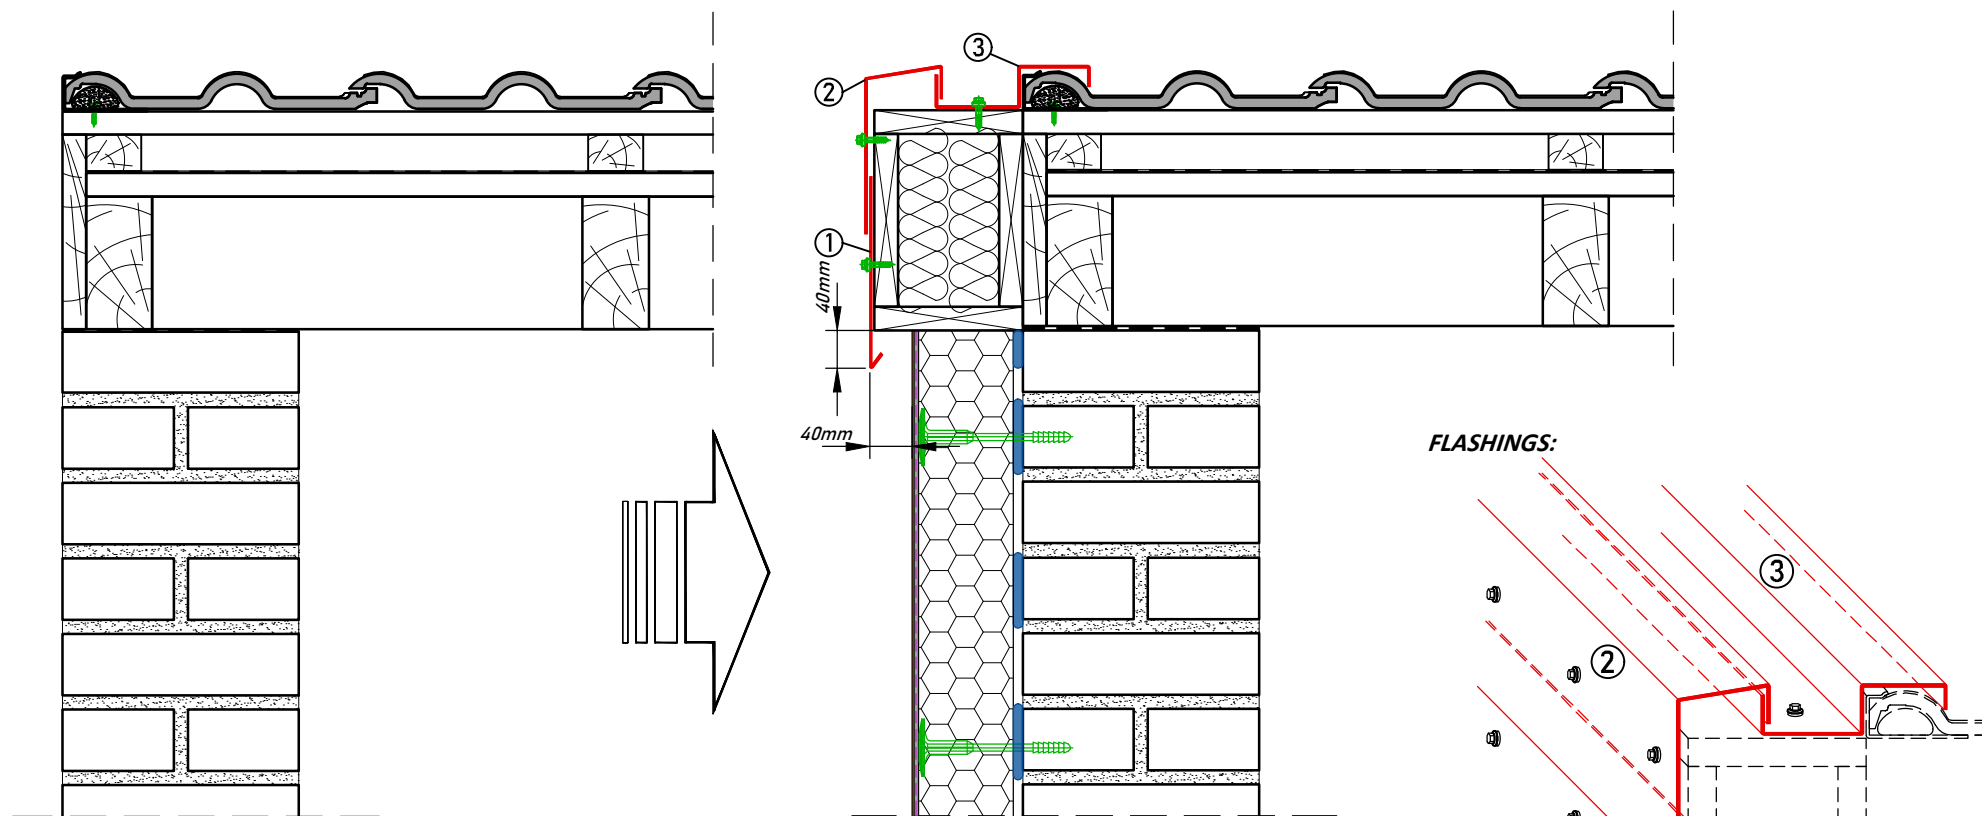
DETAIL OF THE ROOF'S VERGE OVER GABLE WALL OF THE EXISTING BUILDING
